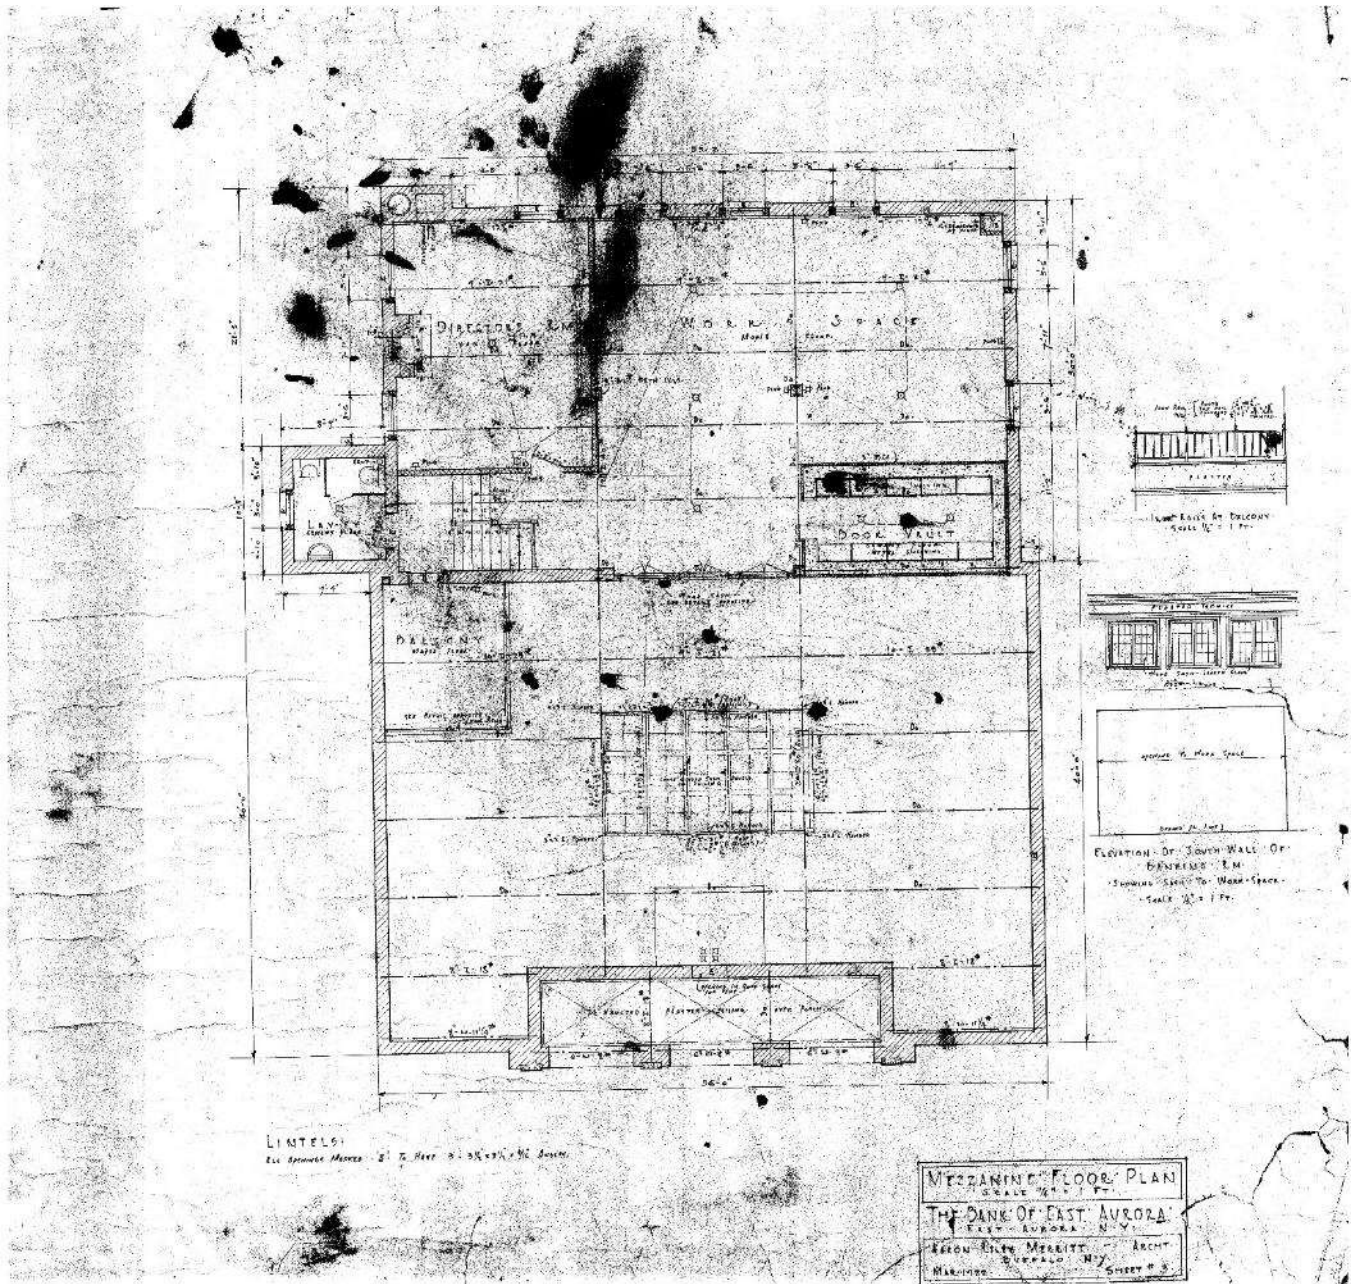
Original Mezzanine Floor Plan by Aaron Riley Merritt
